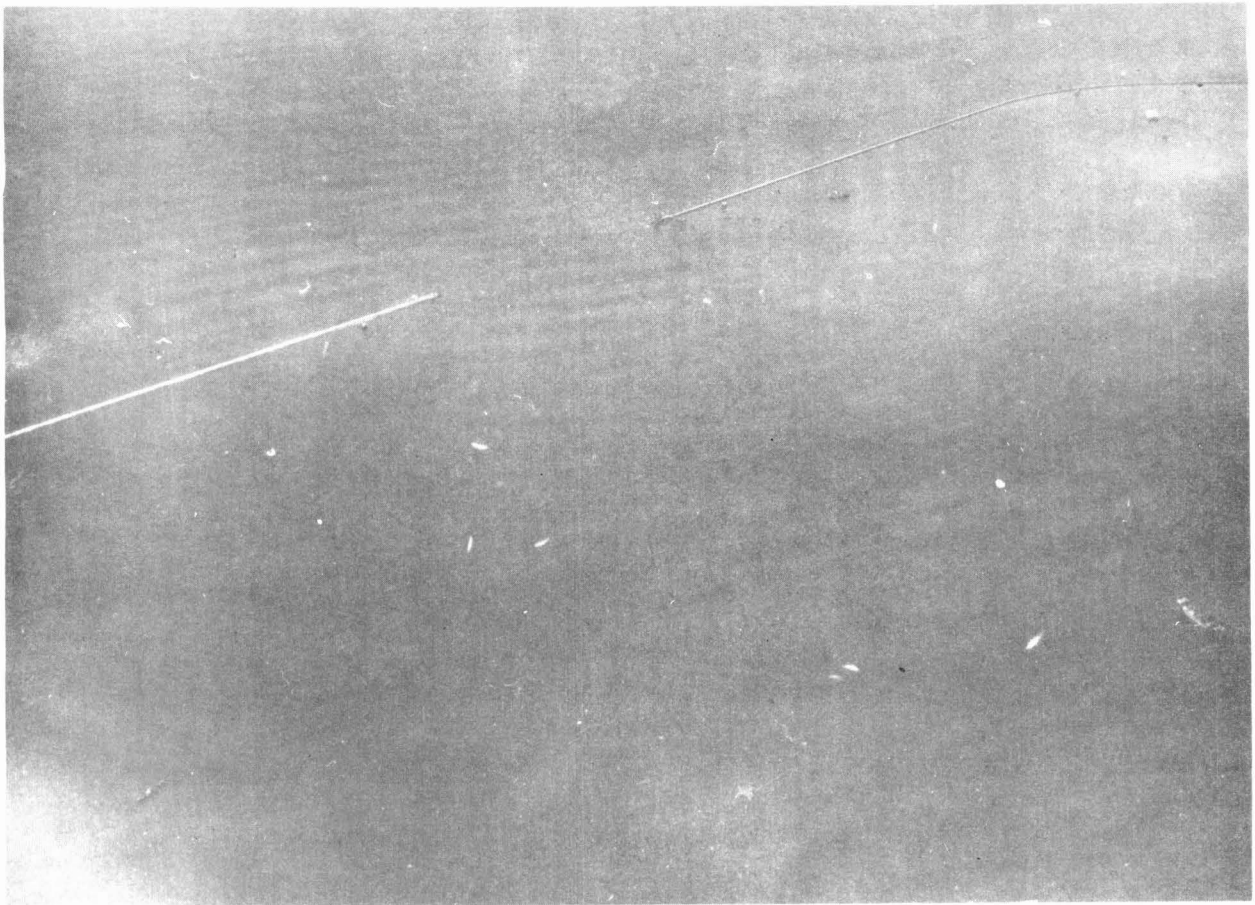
AIR VIEW TOWARD SOUTHWEST FROM 5,000 FT. ELEVATION
